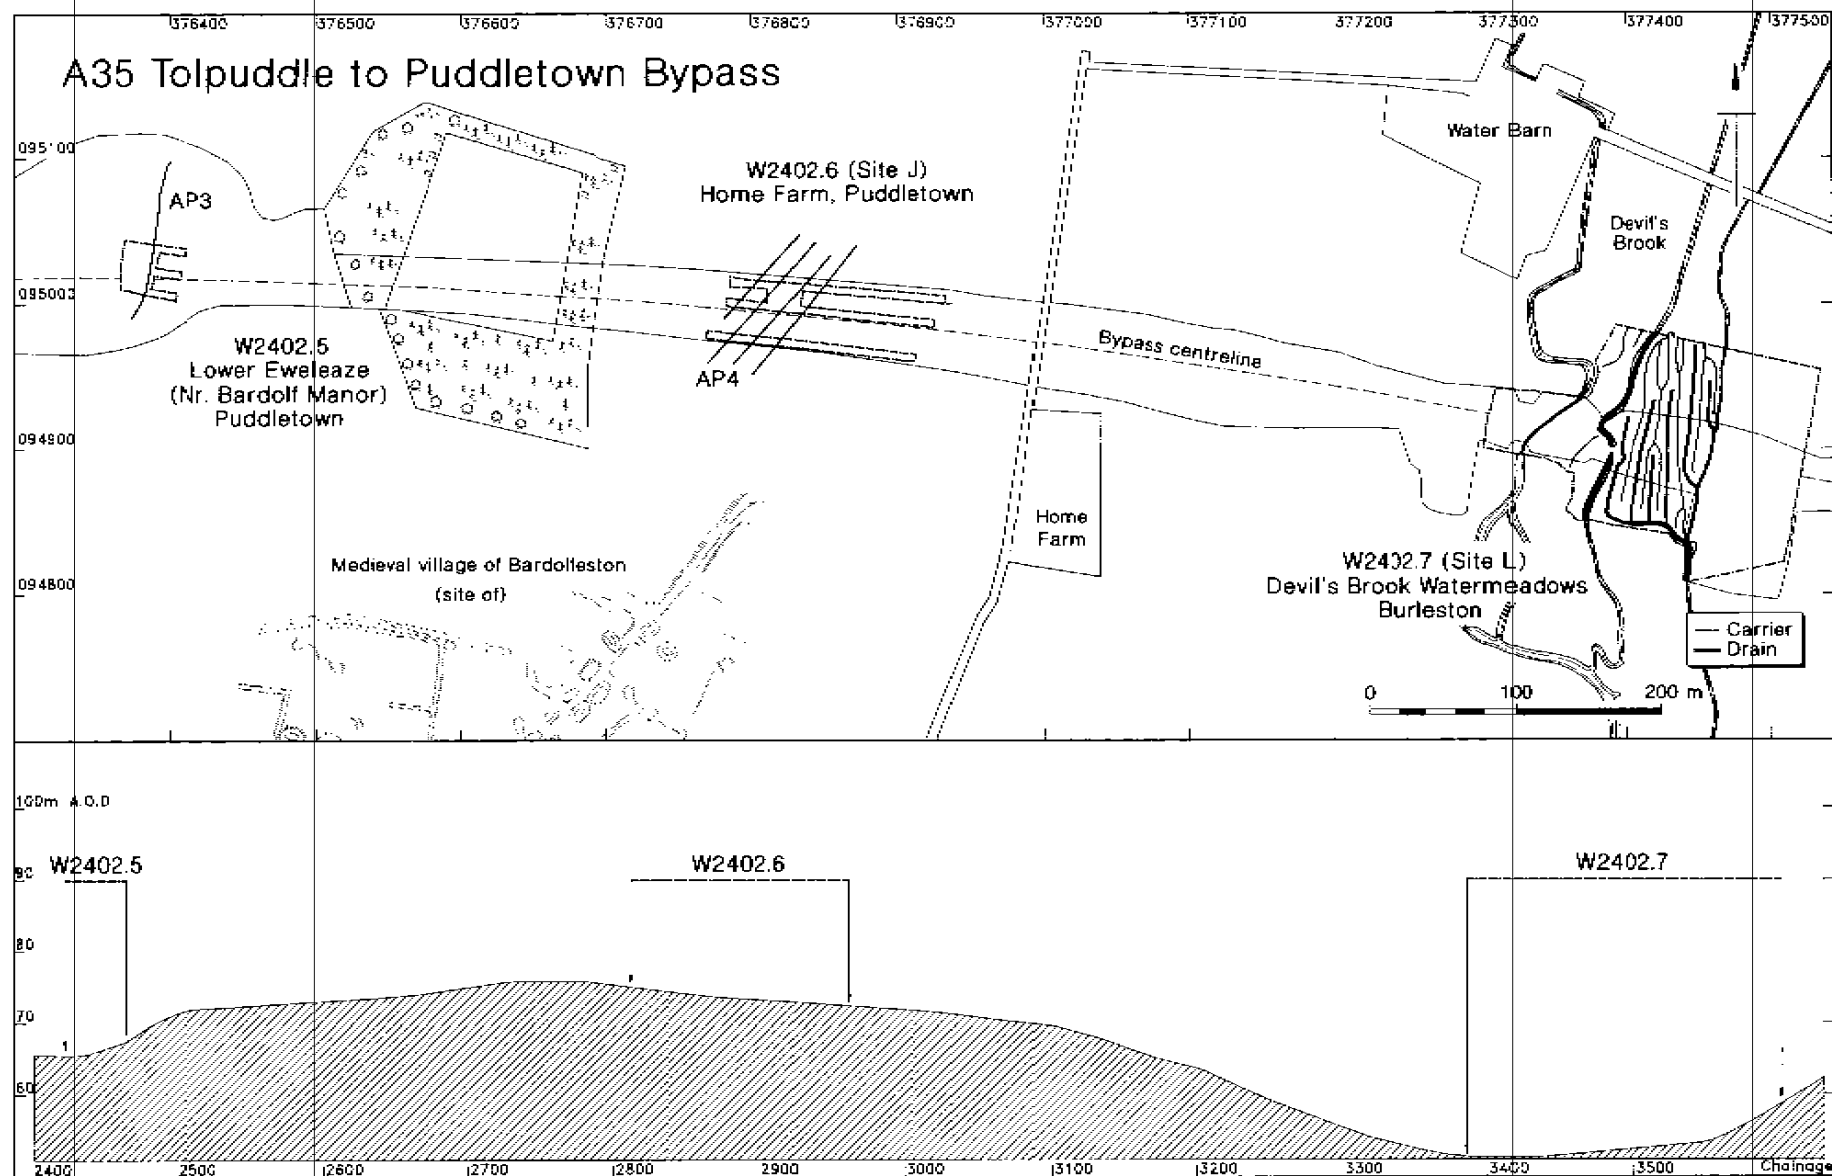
Route detail: Eweleaze to Devil's Brook Watermeadows
